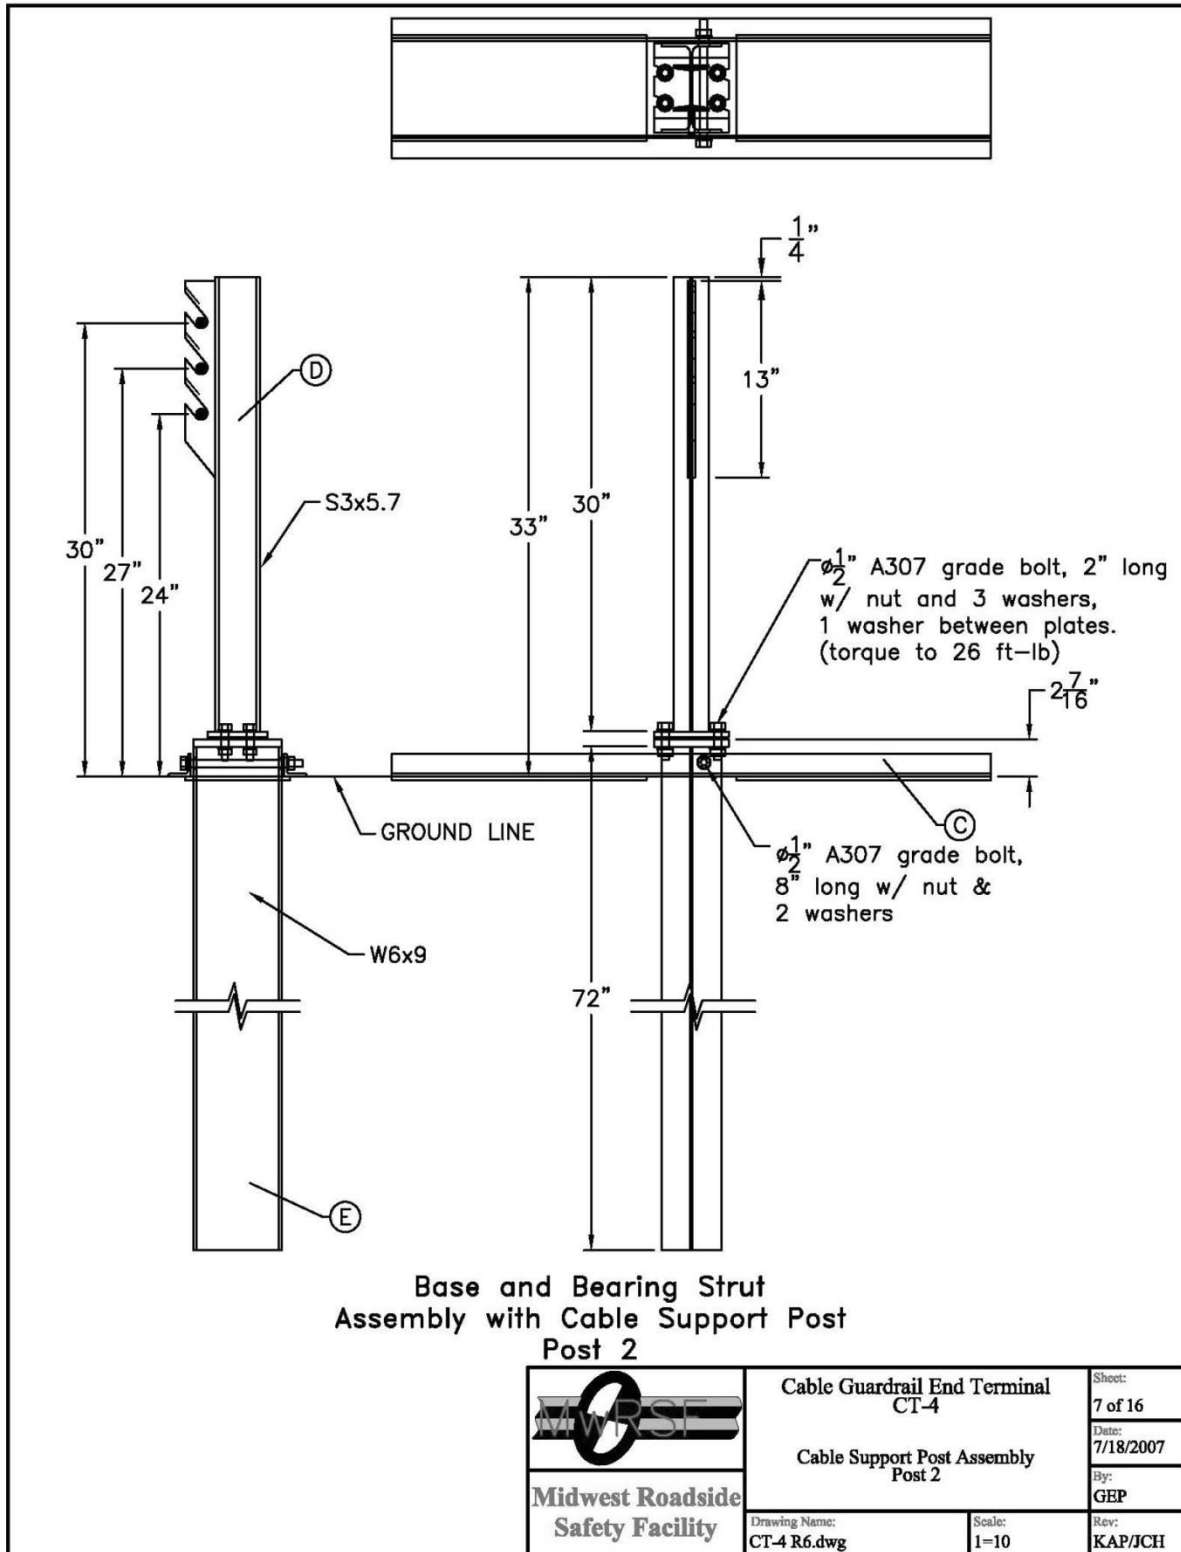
Cable Support Post Details, Cable Terminal Testing, 2000-2007 [65]
